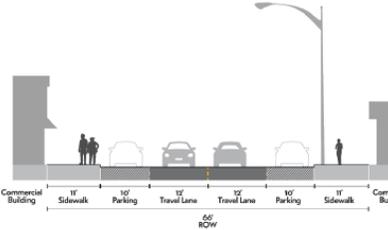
Typical residential Harlem Avenue corridor ROW typology
